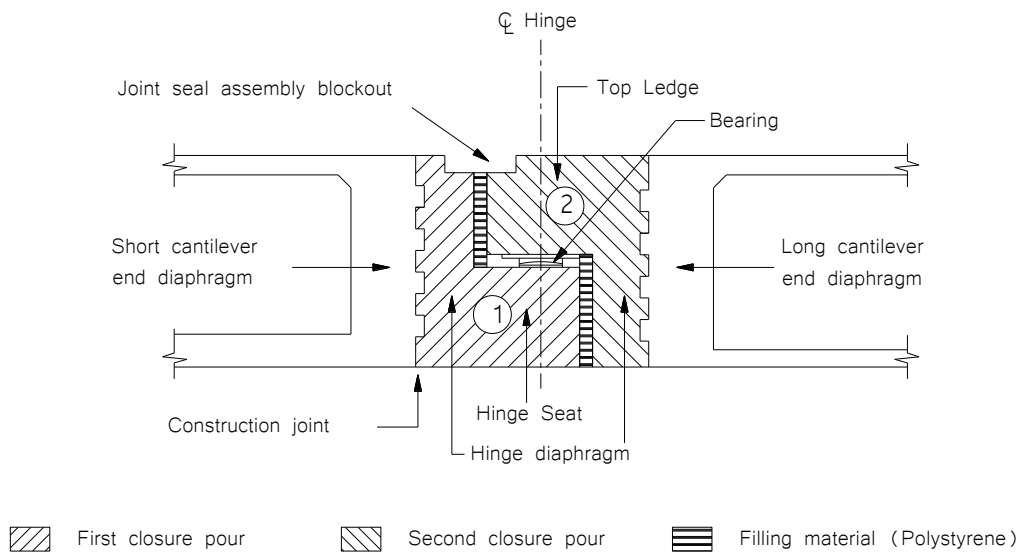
Typical in-span hinge of CIP/PS bridge
